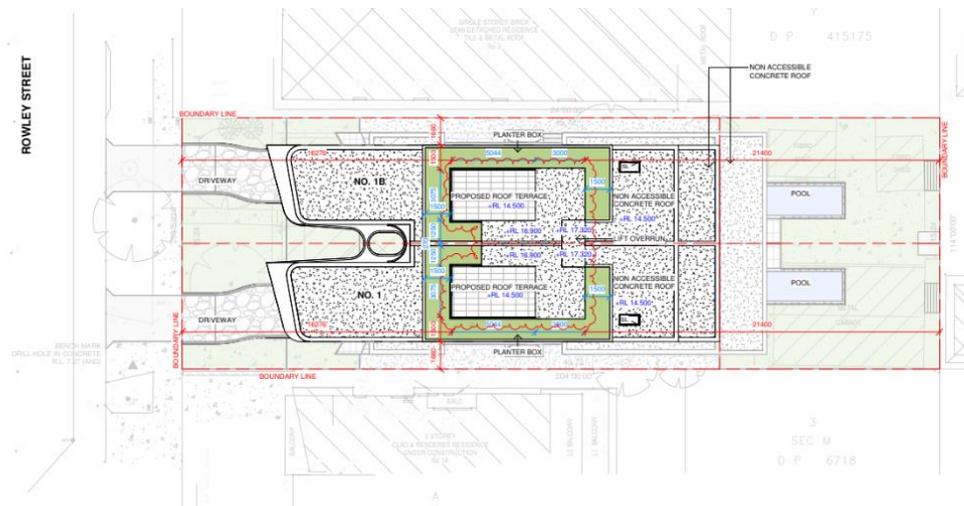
Extract of proposed site plan (Source: Resolut, 2024).
